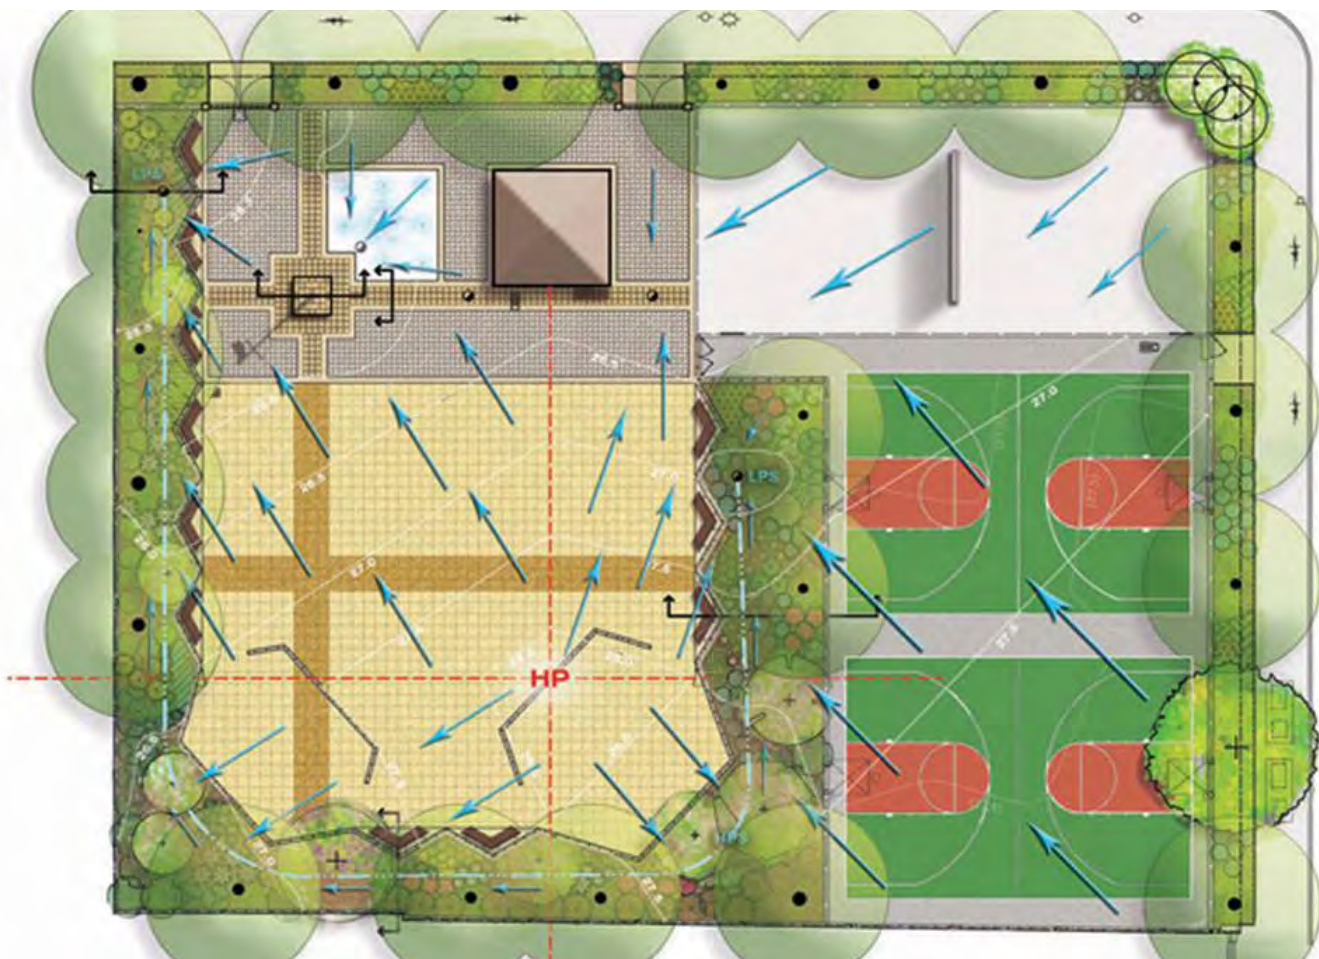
Plan: Pearly Gates Park Renovation (Source: NYC Parks and S. Koren)
